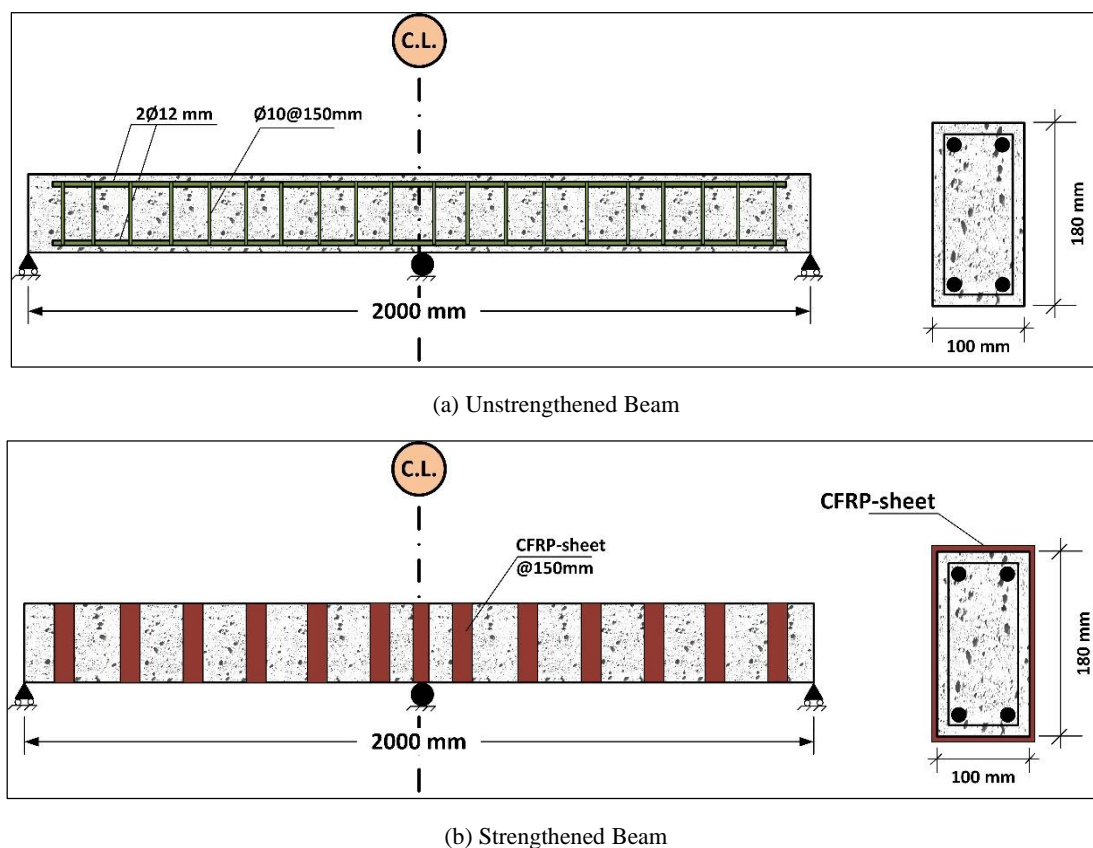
Testing Beam Specimens (a) Unstrengthened Beam (b) Strengthened Beam
